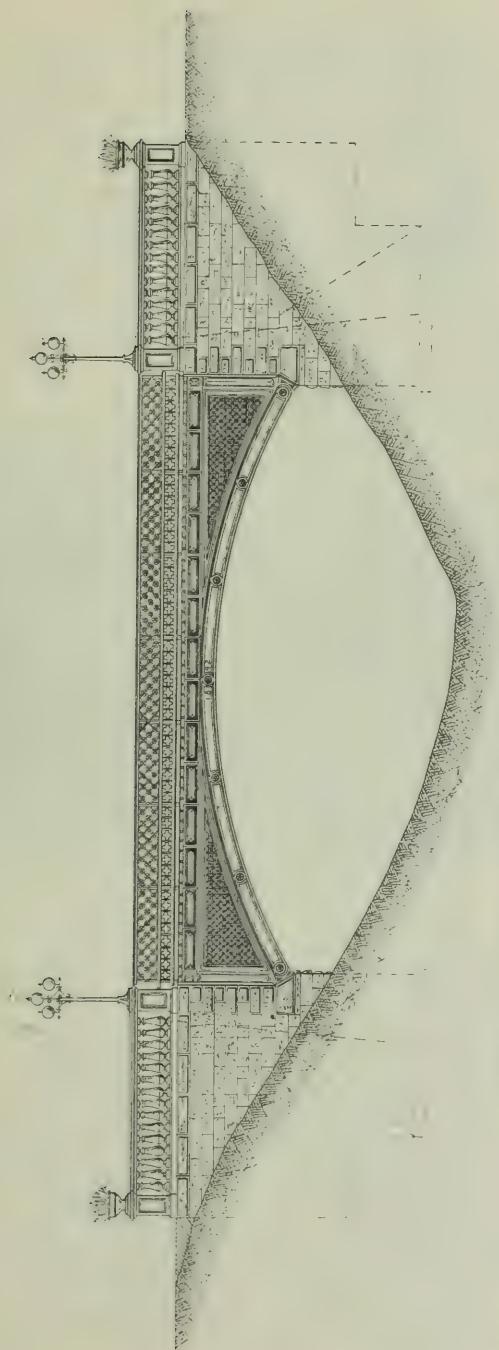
BRIDGE OVER SOUTH RAVINE, LAKE PARK. Arch, 50-foot Span.
